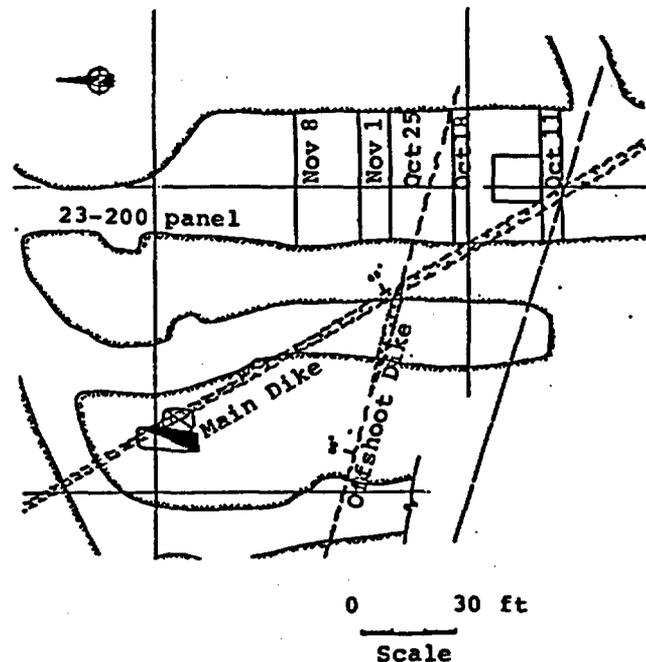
Plan View of 23-200 Undercut Level Showing Blast Locations
